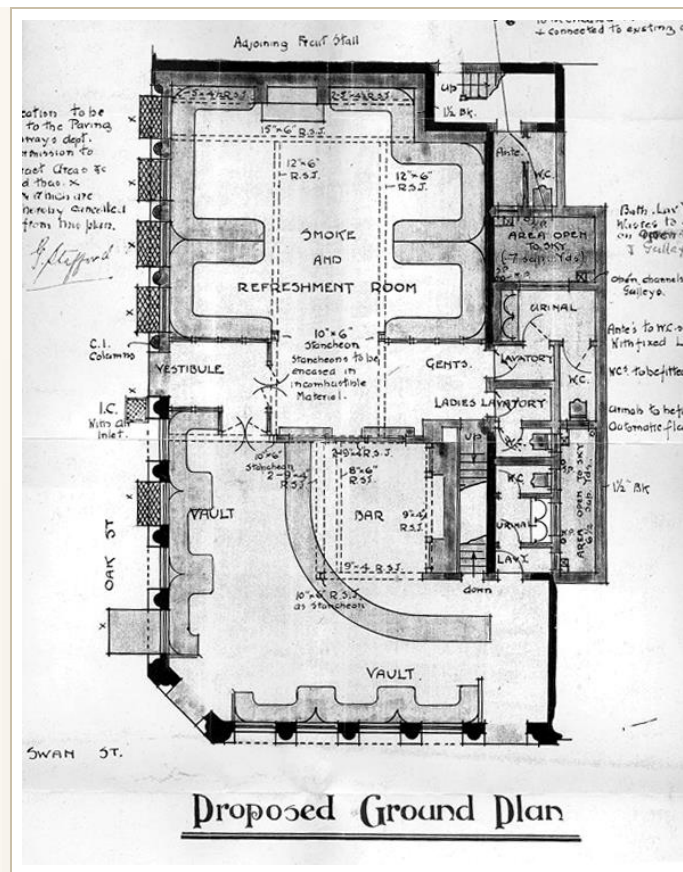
1911 architectural drawing, The George & Dragon, proposed ground floor
